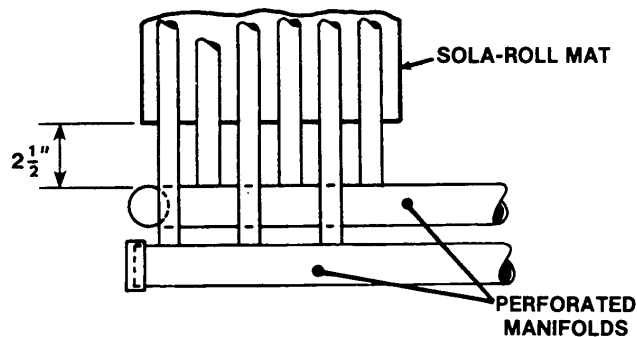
TAKE DIMENSIONS AT HEADER END
